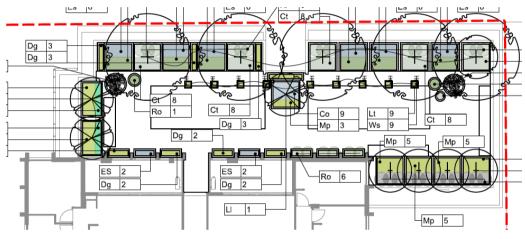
Ground floor plan (January 2023) showing the incorporated wind control measures as recommended.
